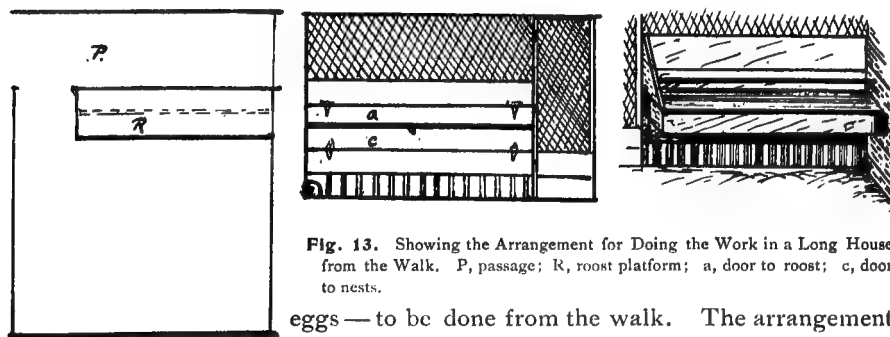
Showing the Arrangement for Doing the Work in a Long House from the Walk. P, passage; R, roost platform; a, door to roost; c, door to nests.
